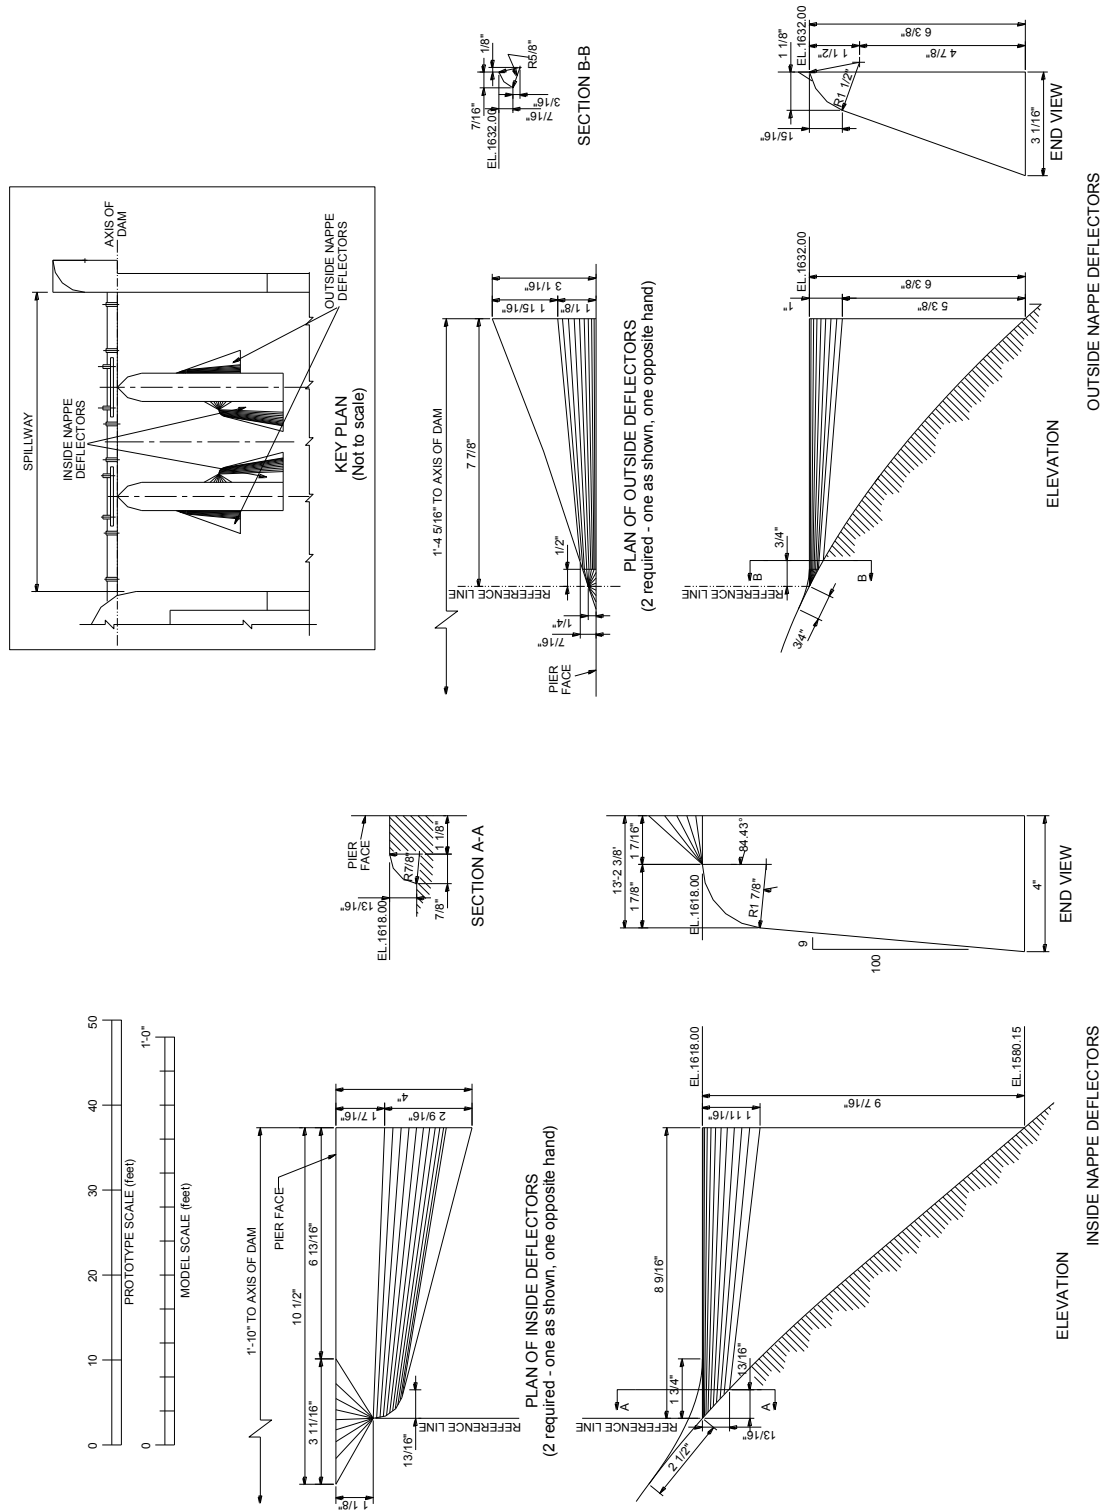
Plan, Elevation, and Section of Nappe Deflectors for 1:48 Sectional Model
